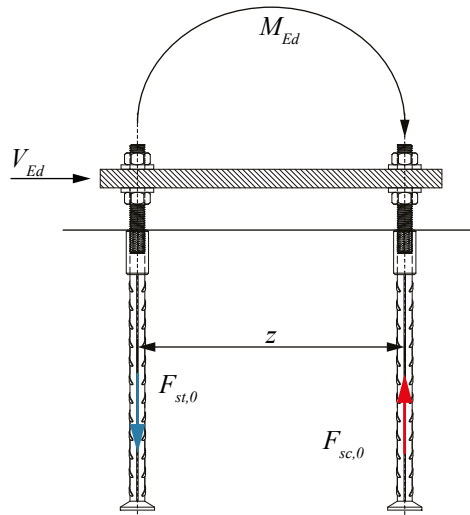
Structural behavior of anchoring couplers in column-to-foundation connections.
